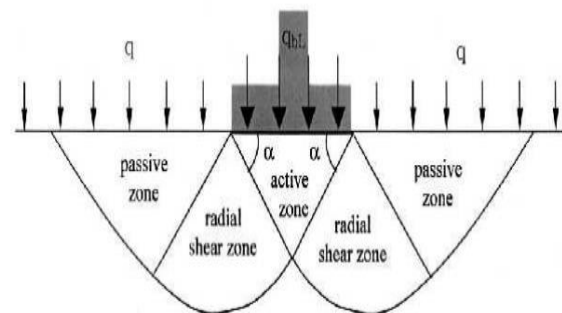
Typical Failure Mechanism of Axially Loaded Footing
